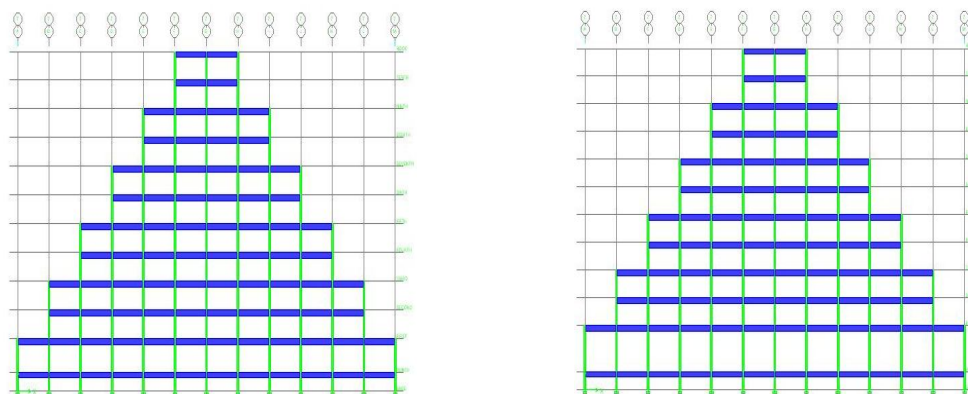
(a) Frame-1 Elevation (b) Frame-2 elevation
